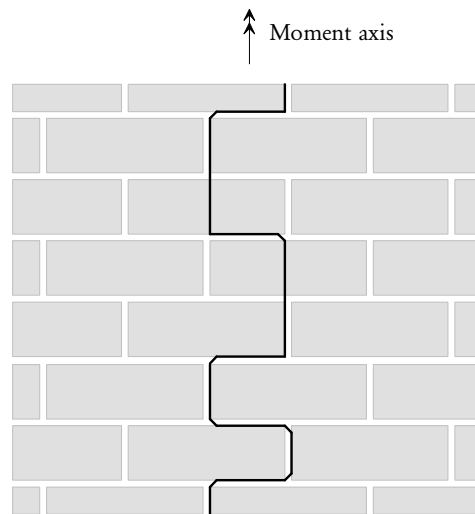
Mixed failure along a vertical crack in horizontal bending, consisting of both stepped and line failure.
